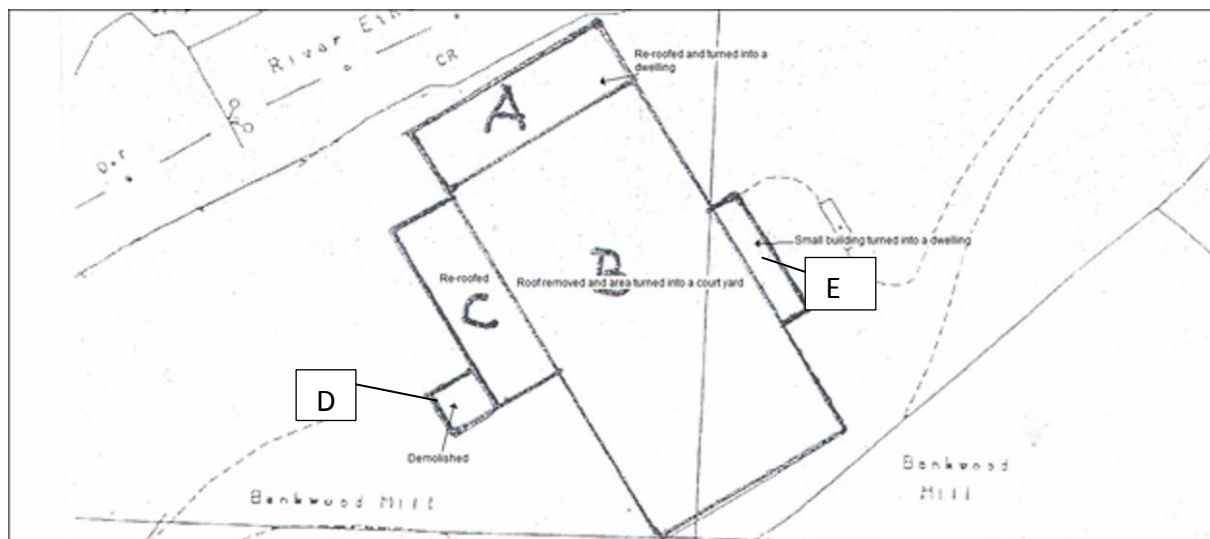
buildings to be demolished and converted. 'A' will be converted to a dwelling, 'B' is to be re-roofed to form a courtyard, 'C' will be re-roofed and converted, 'D' will be demolished and the 'E' will be converted to a dwelling
